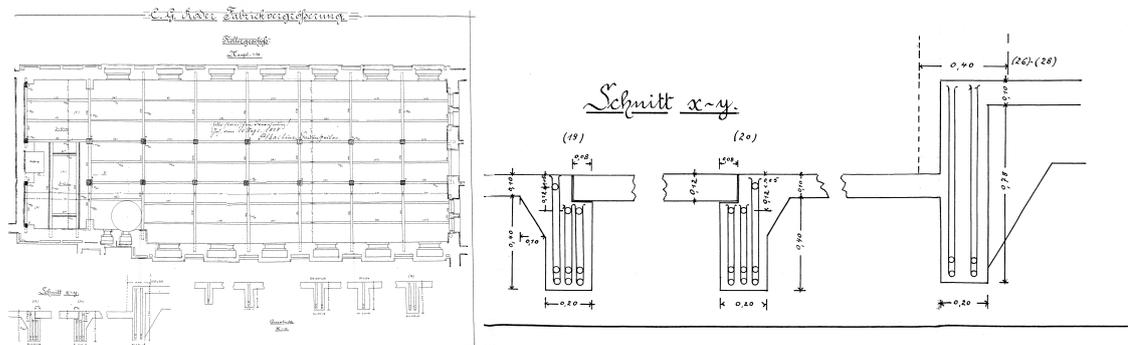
Reinforcement plan of the cellar ceiling with detail showing the reinforcement, drawn by Martenstein & Josseaux; (Bauakte, p. 143)
